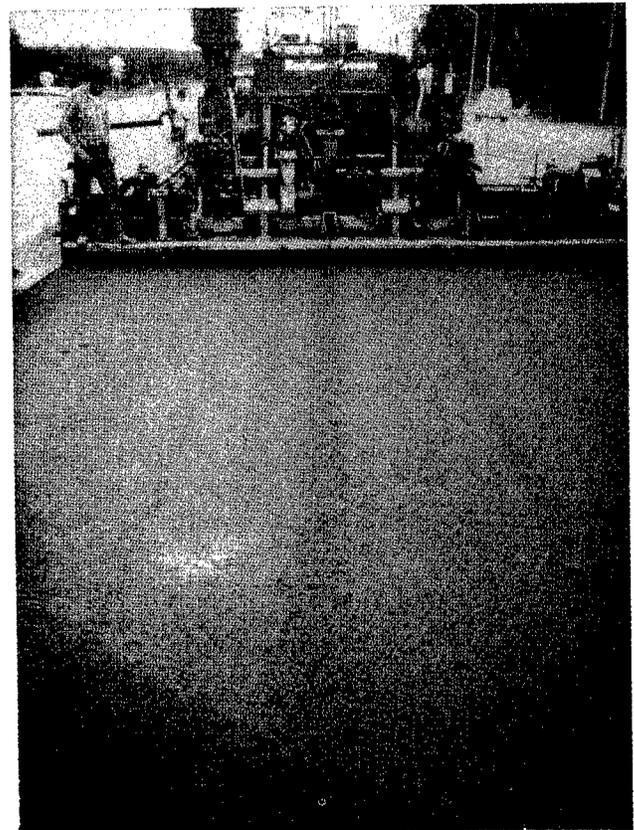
Thin layer of asphalt concrete left on pavement surface under windrow elevator (*J. Scherocman*).
